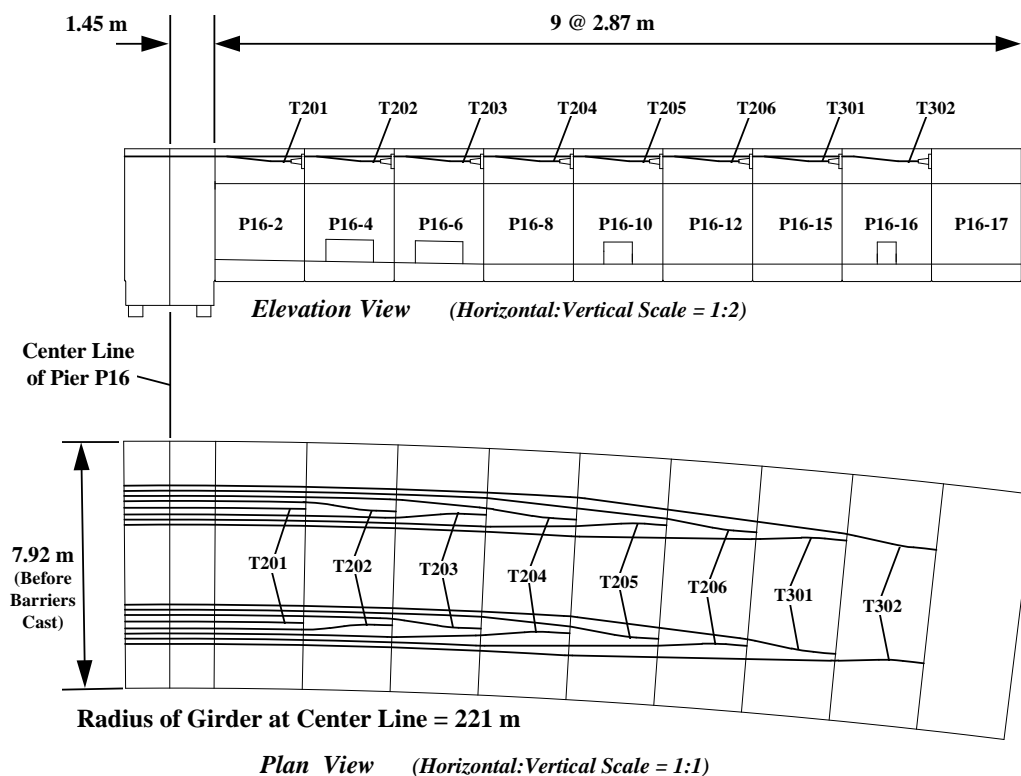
Layout of segments and cantilever tendons in the P16 upstation cantilever
